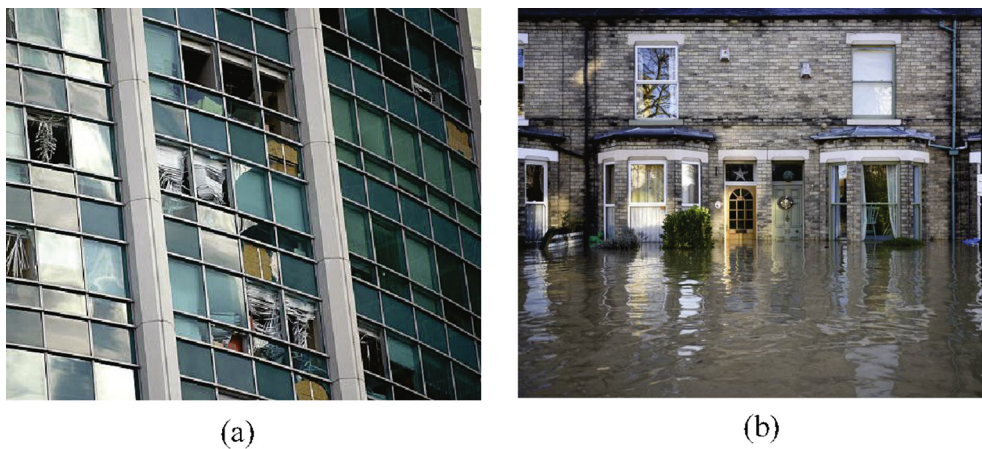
Damaged glass facades due to extreme weather conditions after (a) hurricanes and (b) floods.
